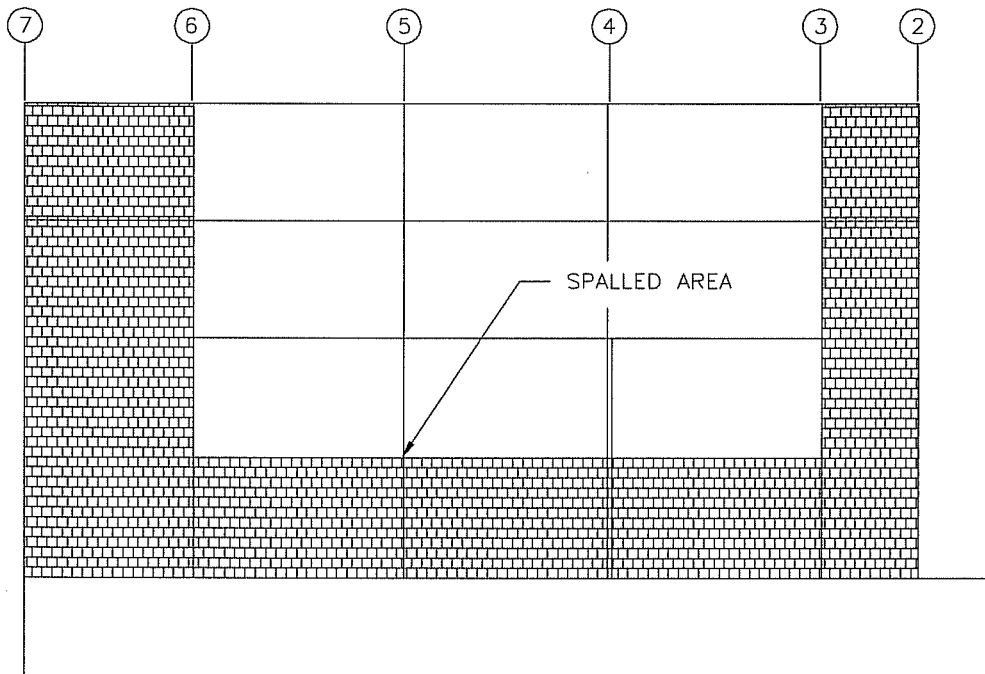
Peninsula Office Building - Observed Cracks in Brick Veneer on the West Wall
